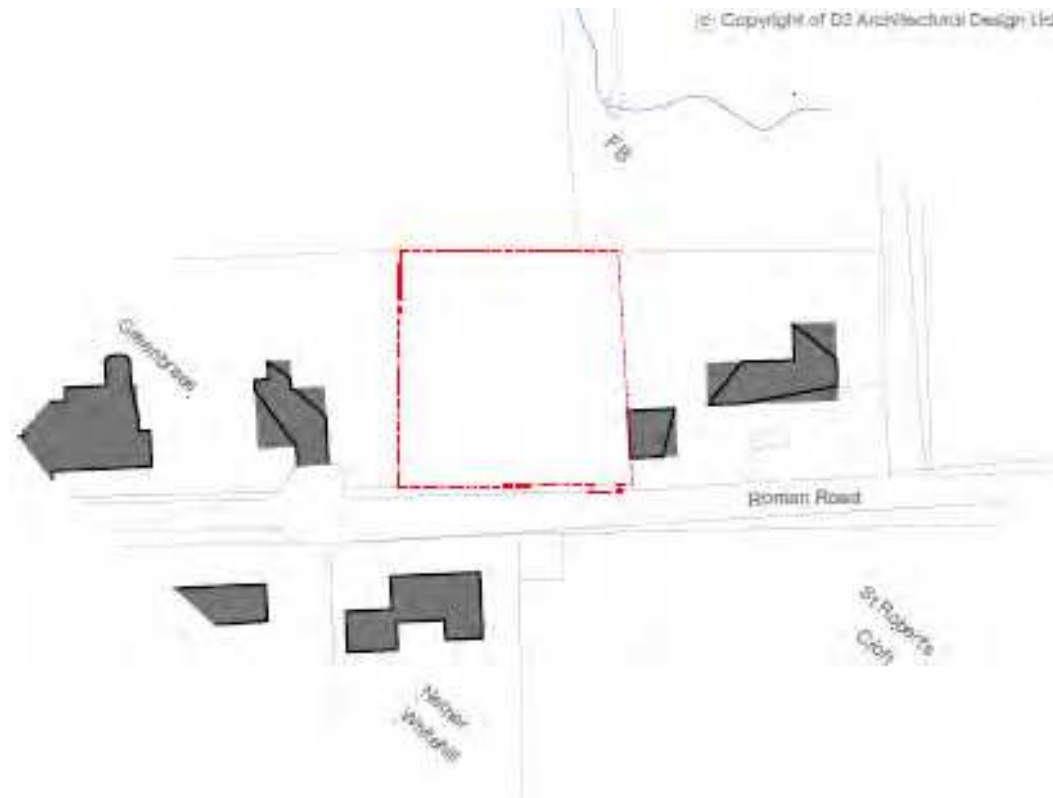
Extract from 23023-D01 Site Plan (Source: D2 Architectural Design).
